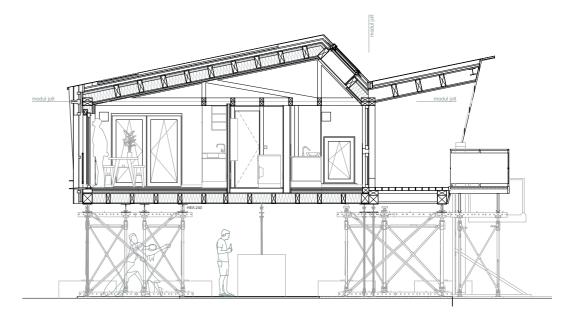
30. The section of the HDU showing the scaffolding, living space
